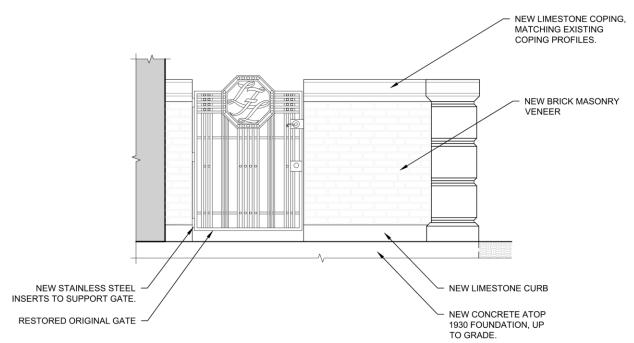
Gate Option B (at west courtyard). A new masonry wall is constructed atop the 1930 foundation, extending to the corner of the addition.
